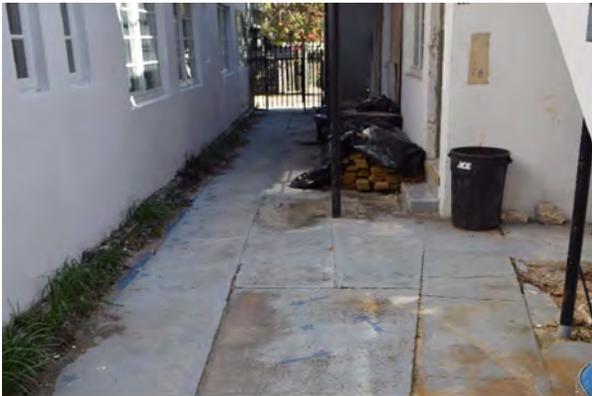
Concrete walkway between Buildings B and D, January 2022.
